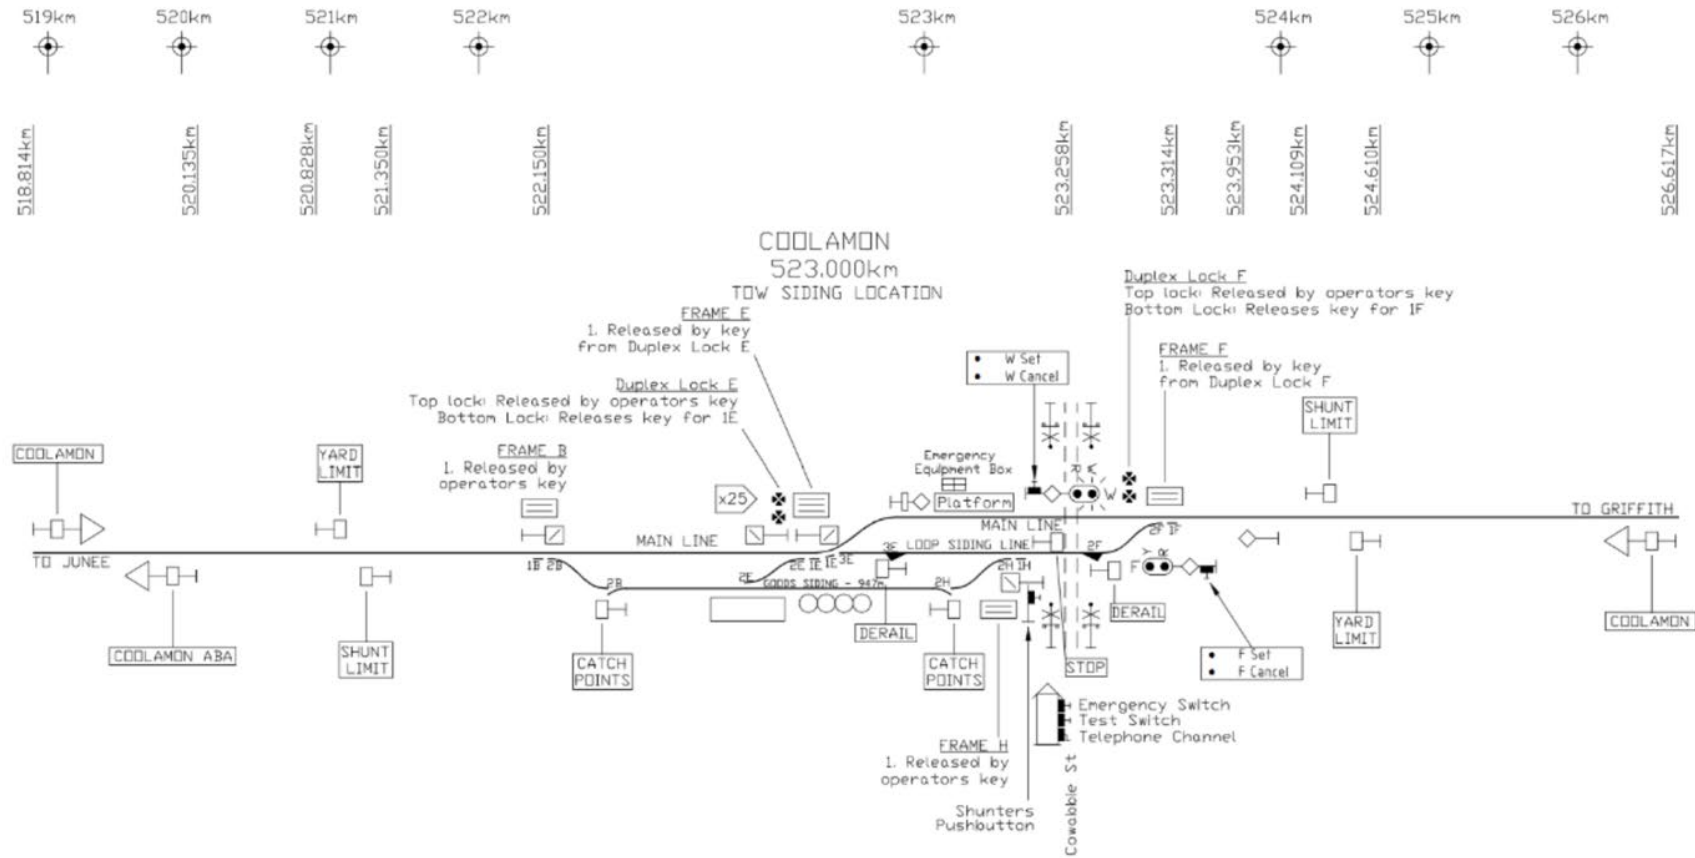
Existing Coolamon Sidings Infrastructure Layout
